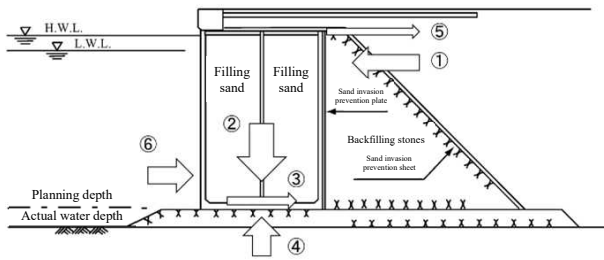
Stability improvement mechanism for a gravity-type quaywall (when applying an improvement method that uses an existing structure)
